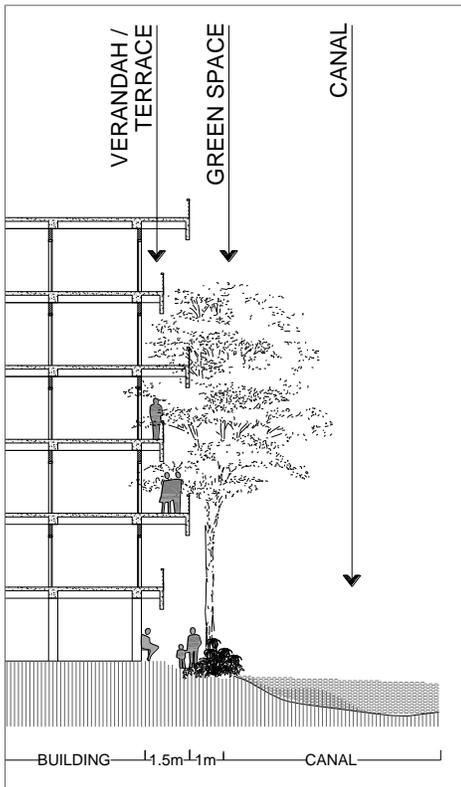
Typical residential building section with landscape feature at existing 1m setback along canal
